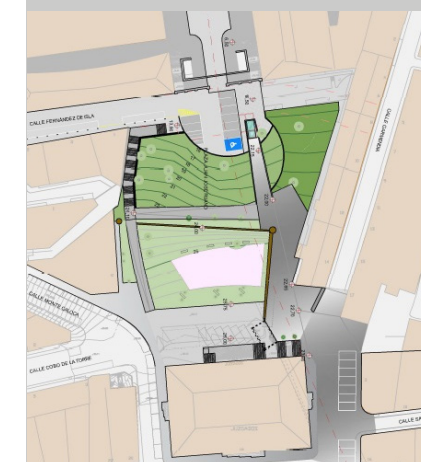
Plan of the lift and the walkway to Cabildo, Route 5.
